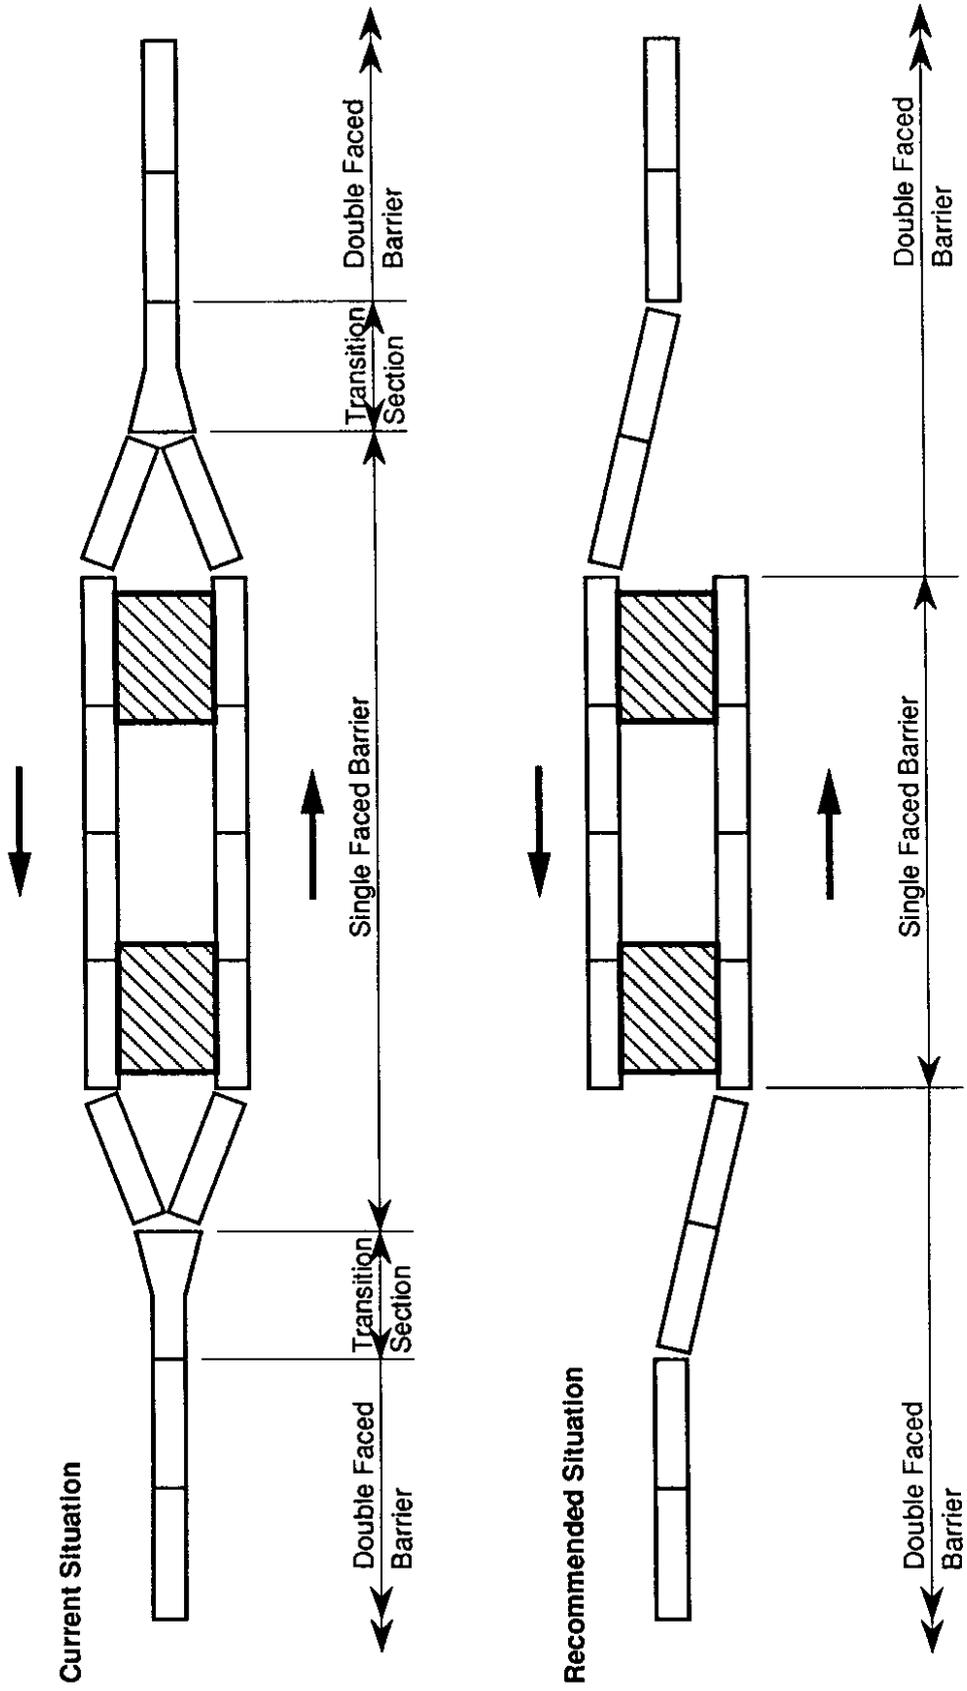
Median Bridge Pier Law Enforcement Waiting Area (Plan View)
